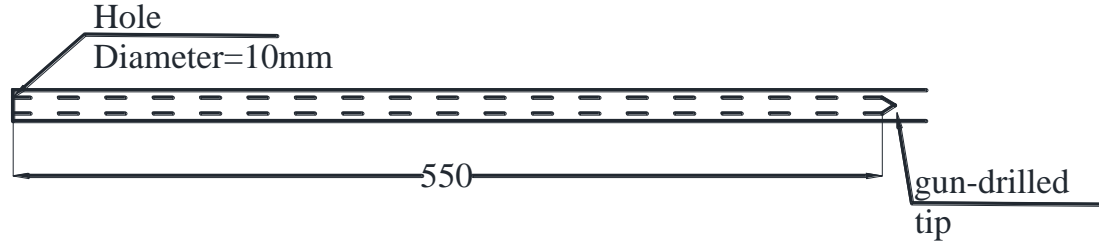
Gundrilled holes in the reinforcements for the beams with 200mm anchorage length.
